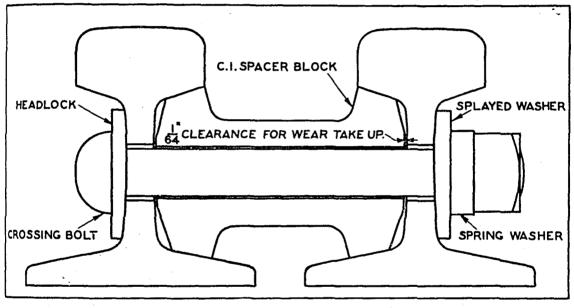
TYPICAL CAST IRON SPACER BLOCK FITTING.
